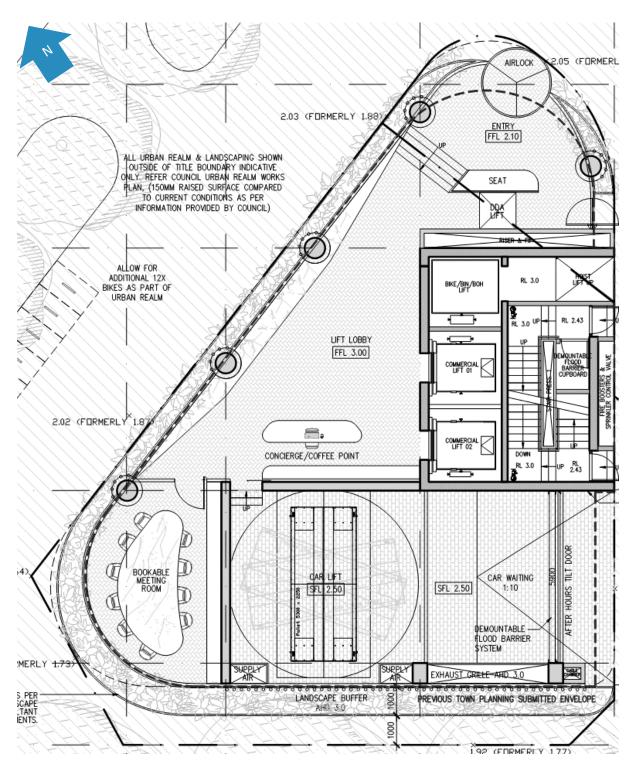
Proposed Floor Plans – Ground Level (Image Source: Elenberg Fraser)
